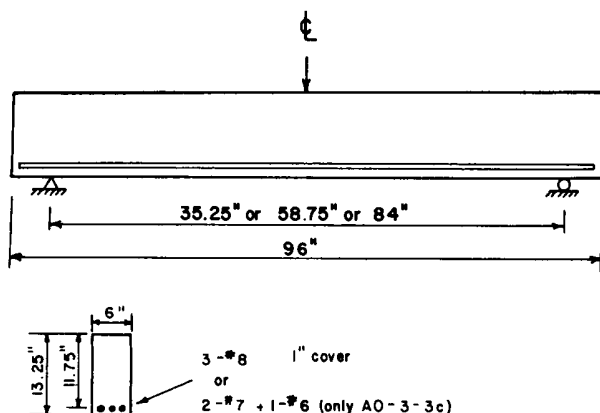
Test specimen (1 in. = 25.4 mm)
